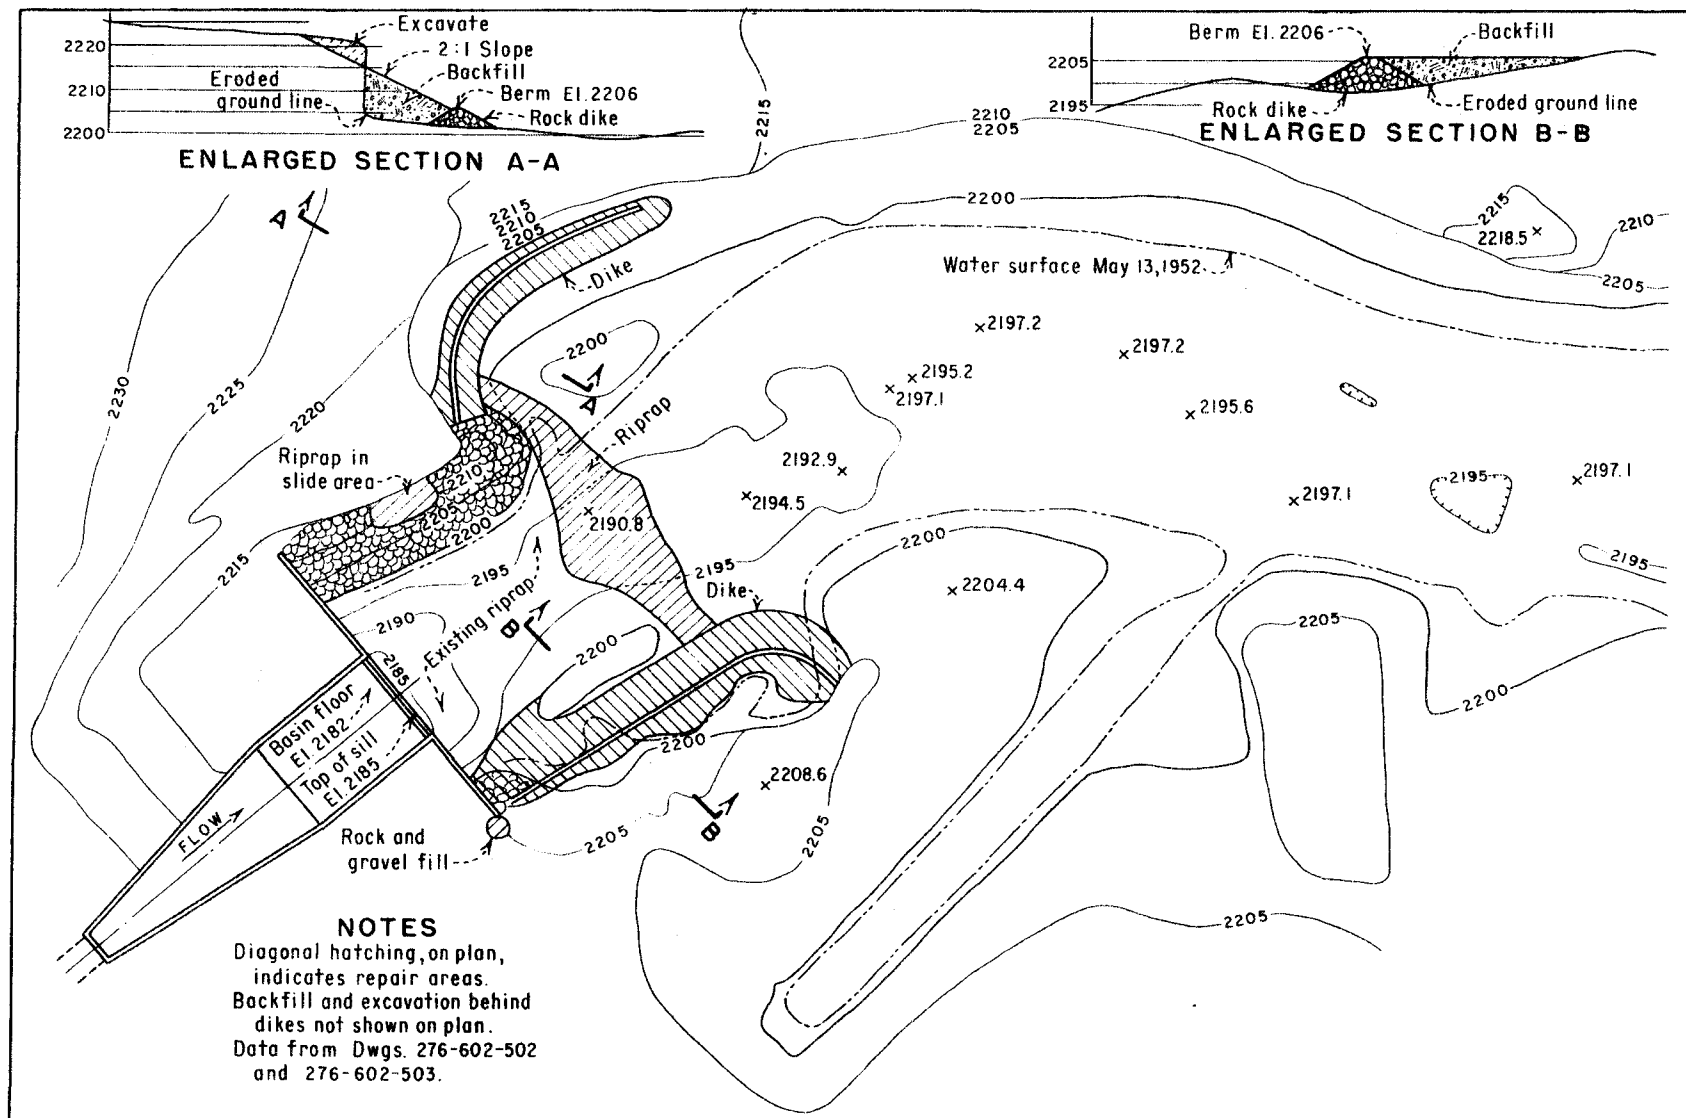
Flood erosion and repairs to spillway outlet channel following 1952 flood.
